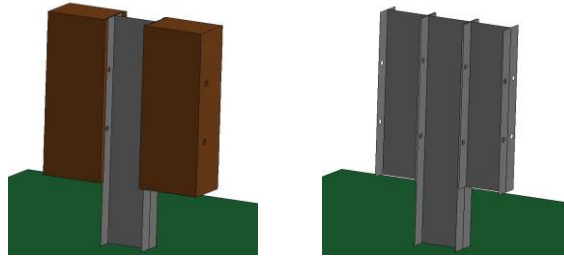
FE models of a wood blockout (left) and steel blockout (right) on the Thrie-beam guardrails.
